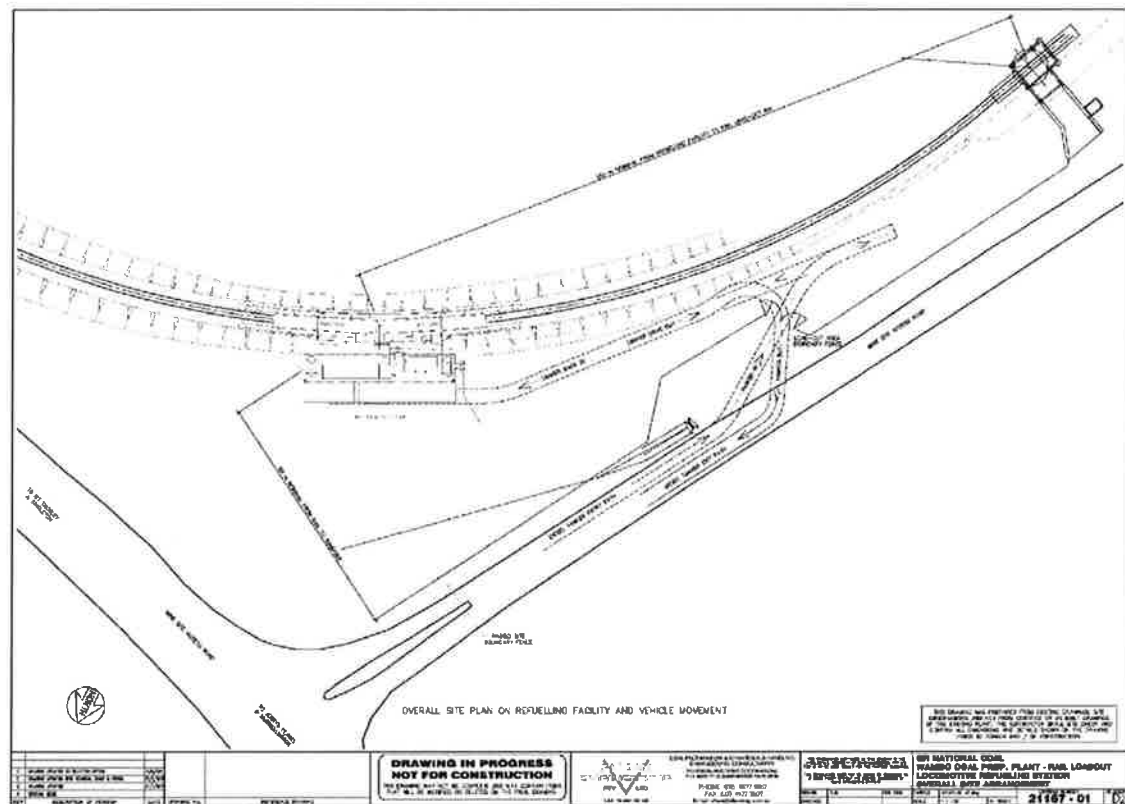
Rail Refuelling Facility site plan and vehicle movement
